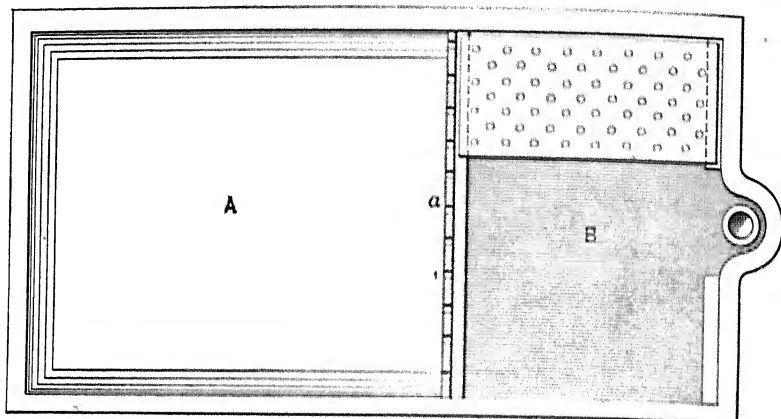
Plan of Sink with Standpipe and Flushpot.
